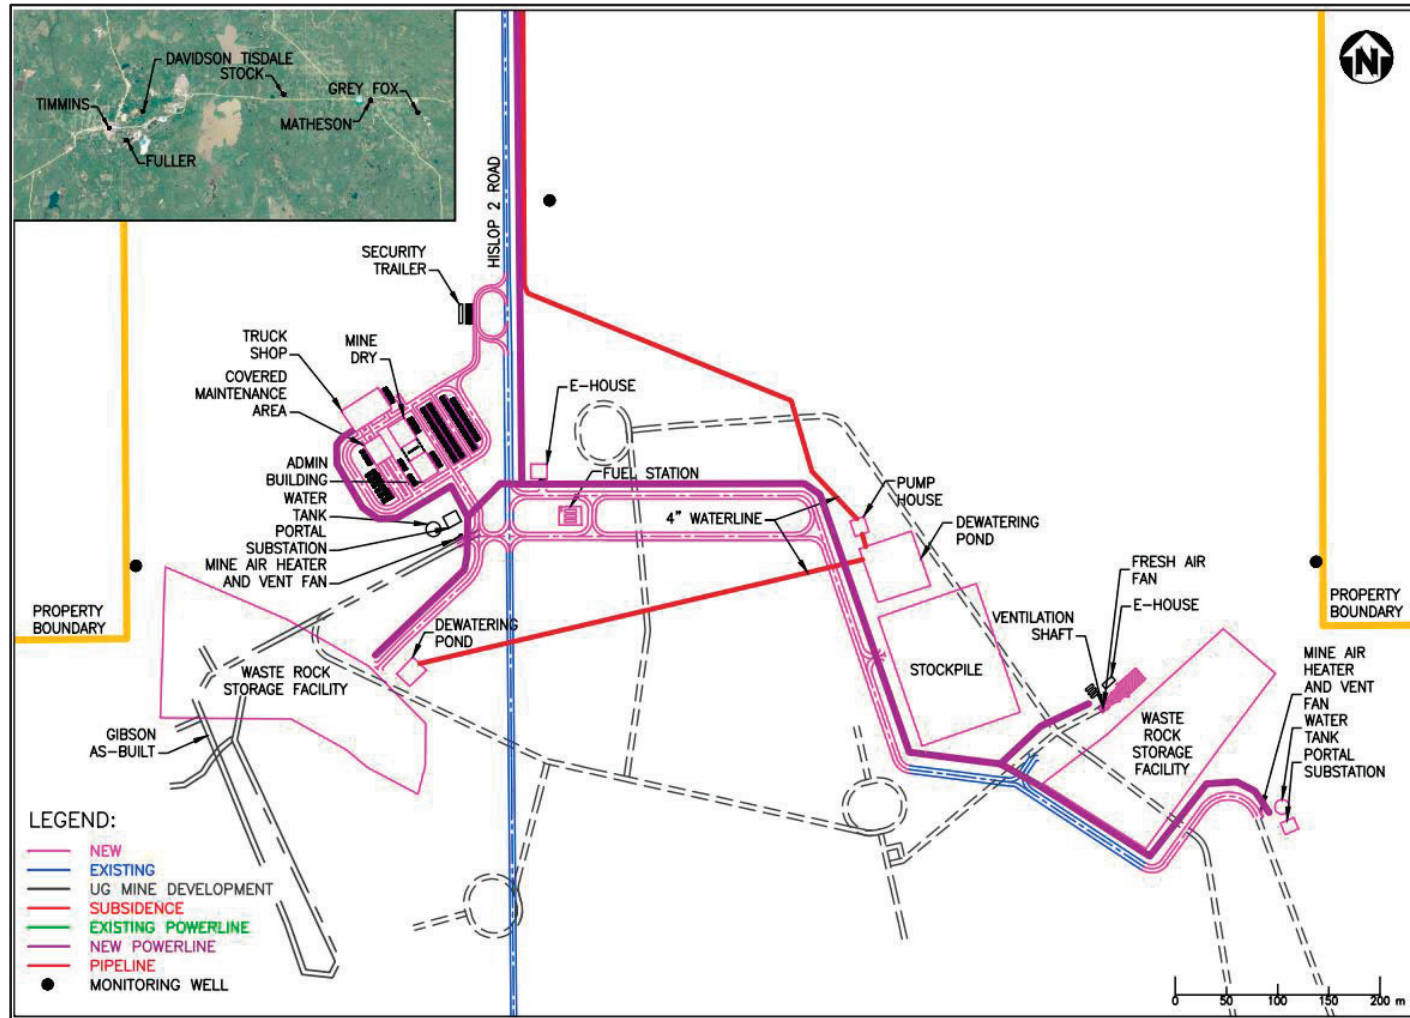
Grey Fox Site Layout (prepared by Wood, dated 2021)
